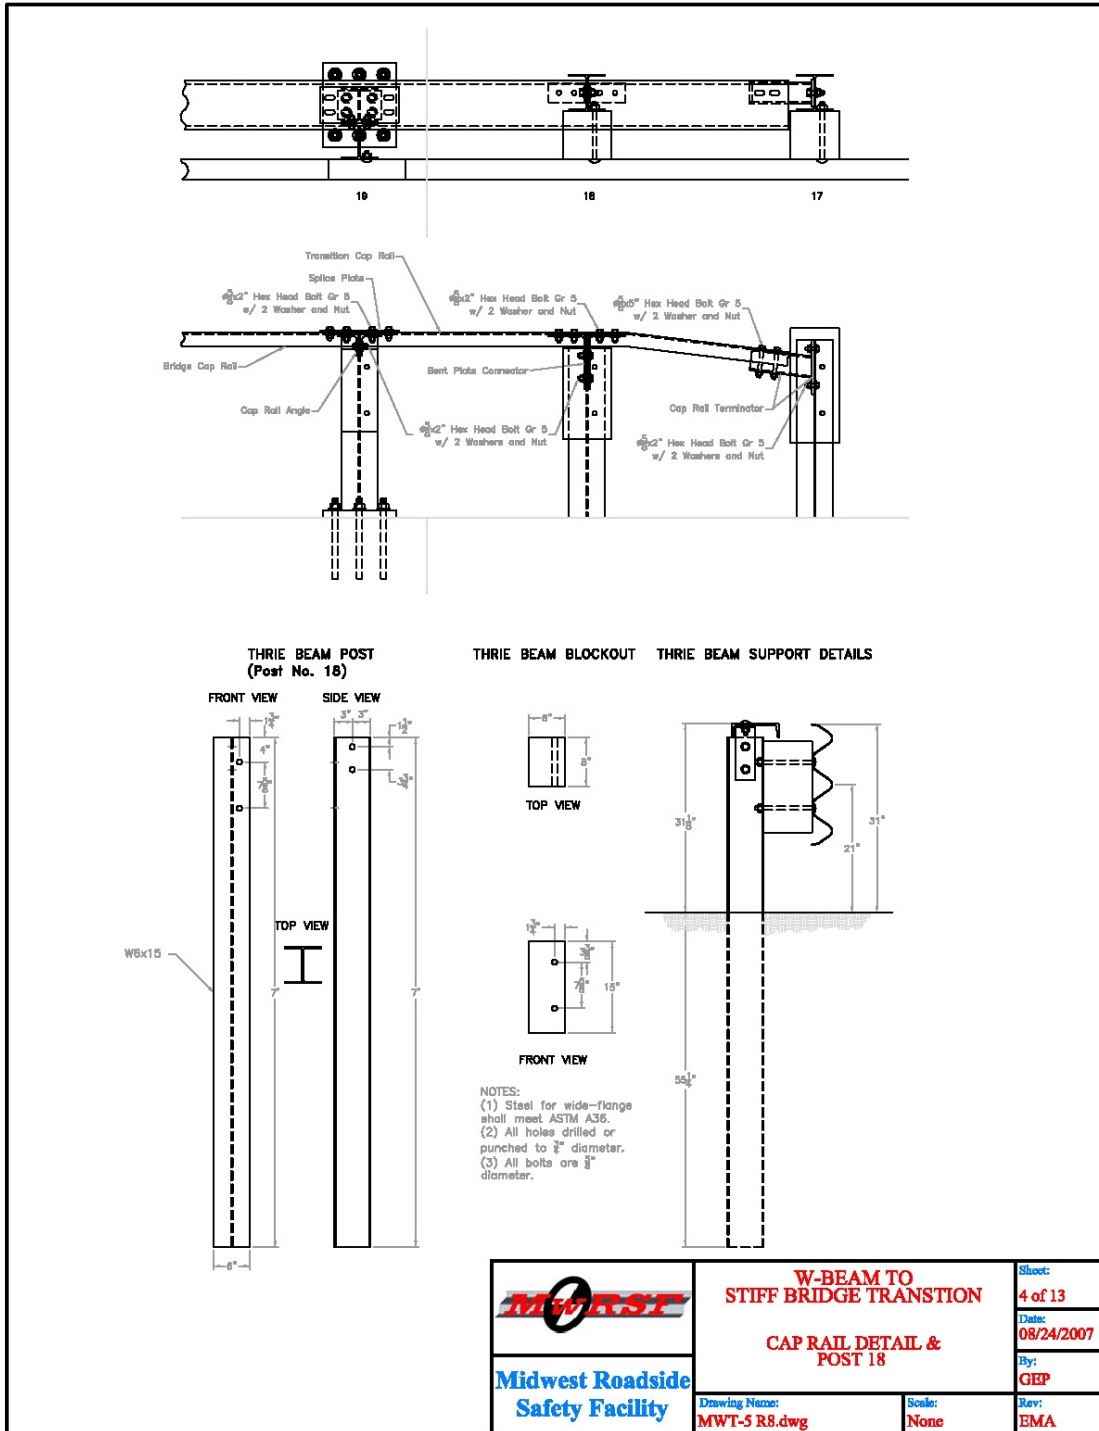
Cap Rail and Post No. 18 Details- Design No. 3 (English)
